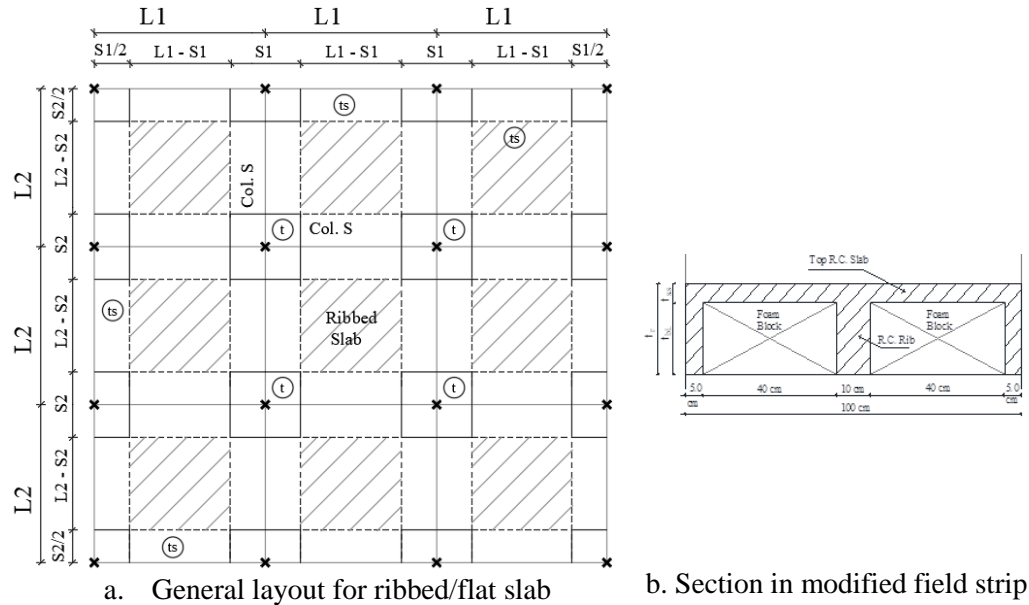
Proposed Mixed Hollow Flat Slab Systems for Regular Plans
